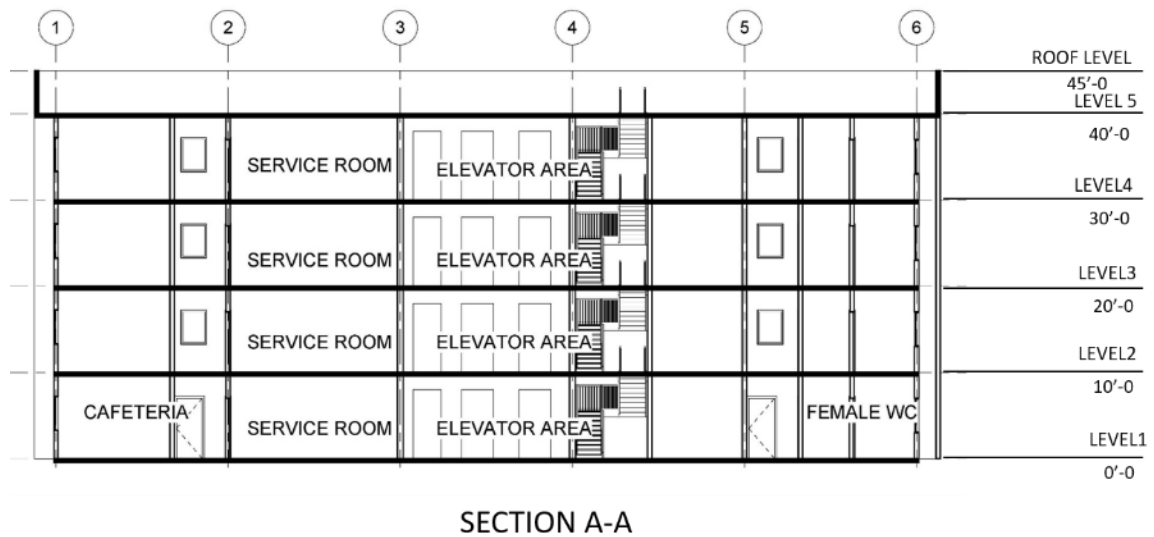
6: Section through the whole building (Ampaw-Asiedu & Norton, 2017).
